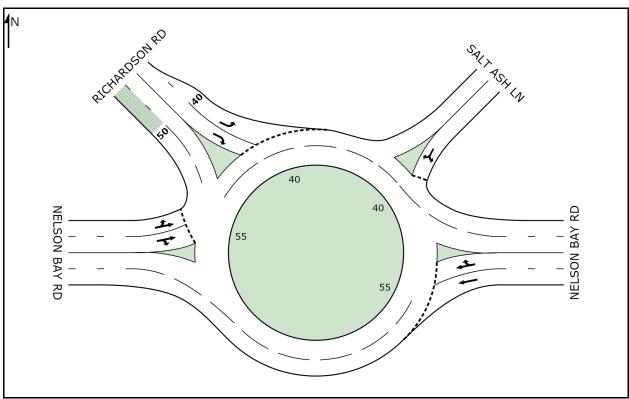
SIDRA GEOMETRIC LAYOUT
